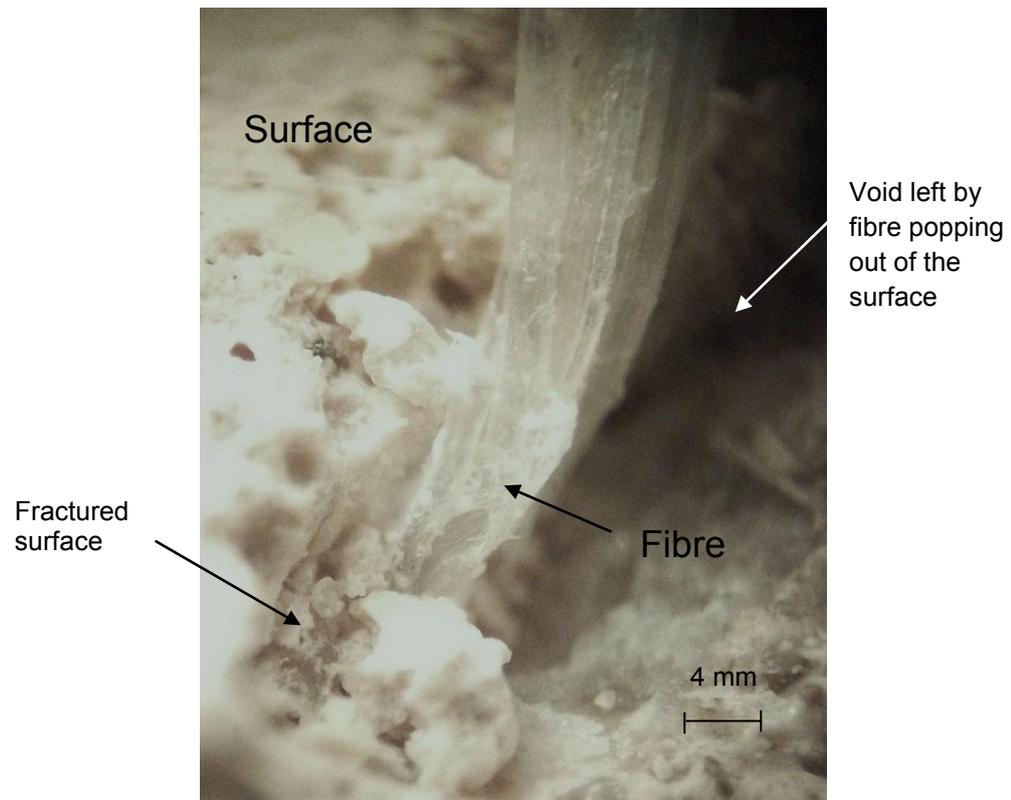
Macro synthetic fibre at the surface of new concrete in vertical orientation. Many fibres at the study site were observed to be exposed at the surface of the armour. (Digital image).
